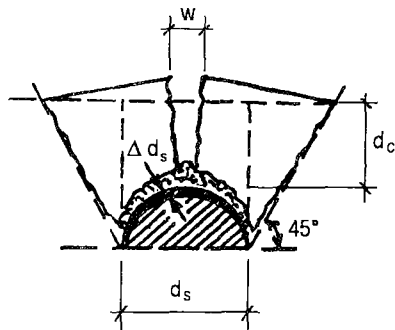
Cross-section of a corroding rebar with cracked concrete cover
